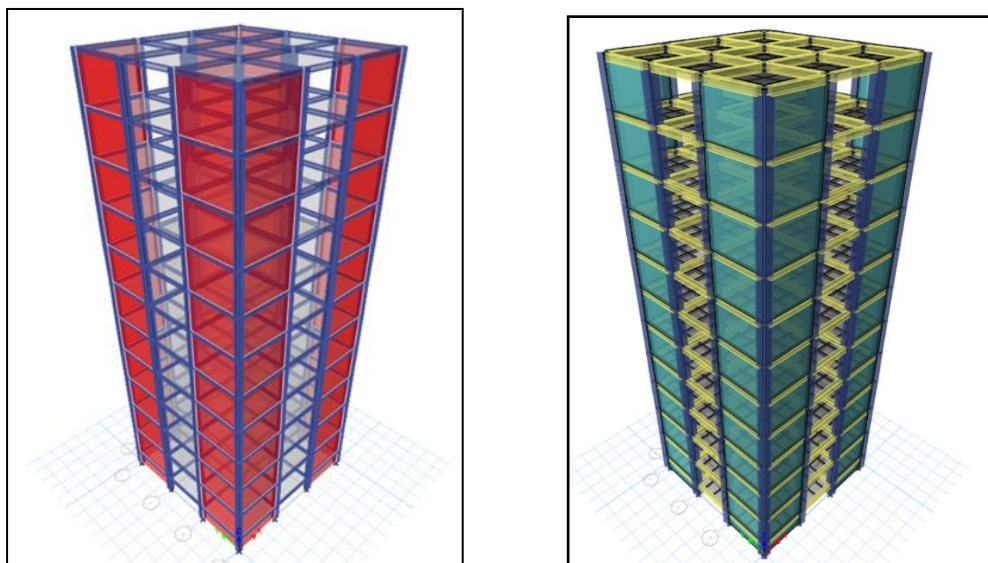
Steel frame with RCC slab and CLT slab building with CLT shear wall
